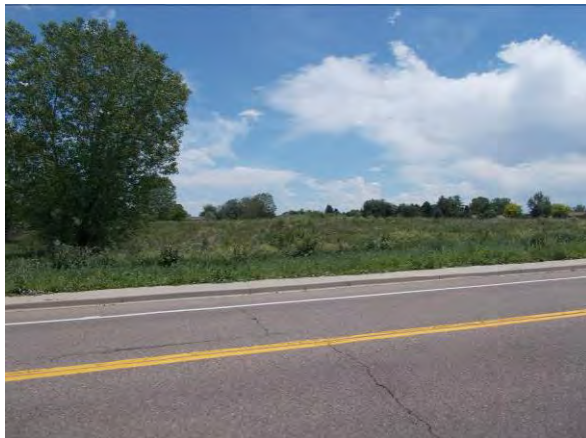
View of the east adjoining property (following Fig Street): a vacant parcel at 6782 Fig Street. View to the east.
